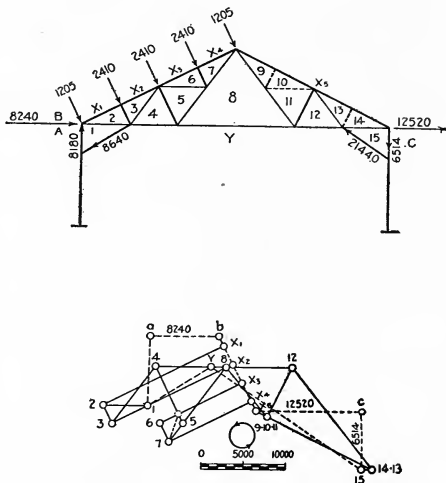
Stress Diagram of Truss-Bent under Wind Load.
